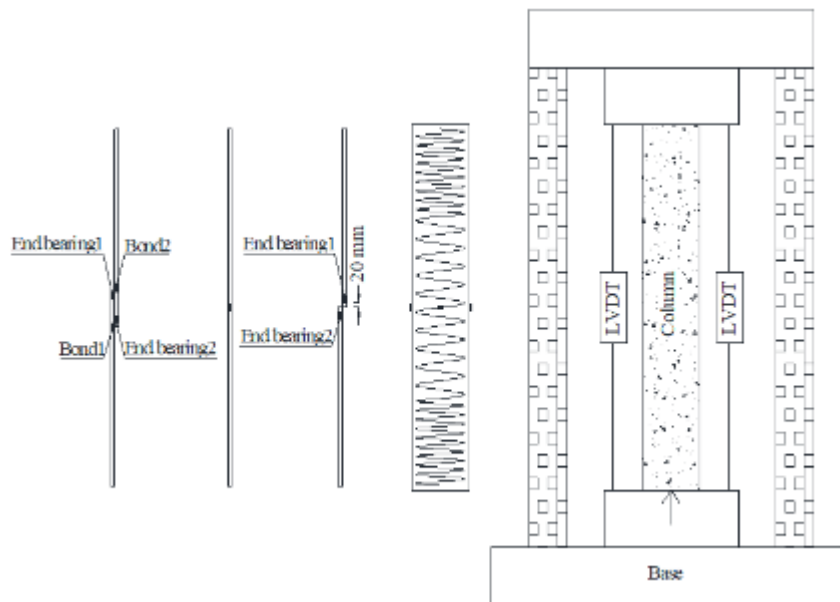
Position of reinforcement, concrete strain gauges, and LVDTs.
